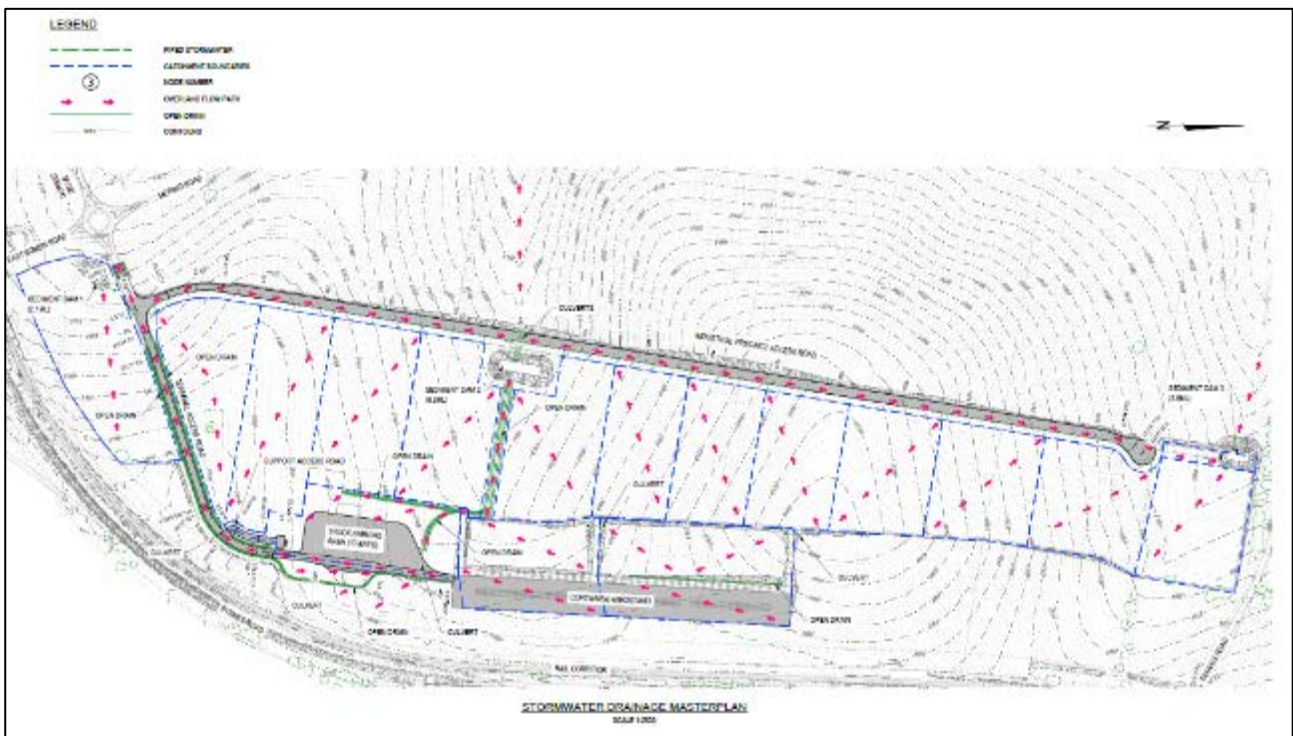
Concept stormwater drainage strategy for the proposed development (Source: Calibre, 2021)
